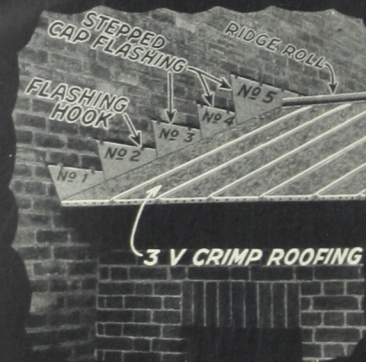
Stepped Cap Flashing applied in Brick Wall
